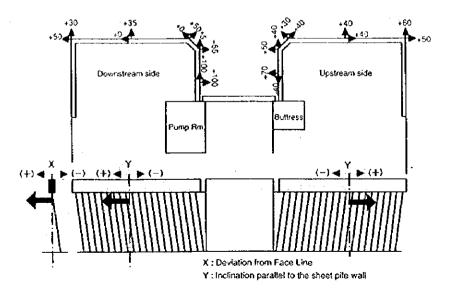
Measuring Record of Inclination of Steel Sheet Pile Wall
